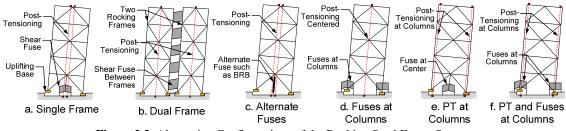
Alternative Configurations of the Rocking Steel Frame System
